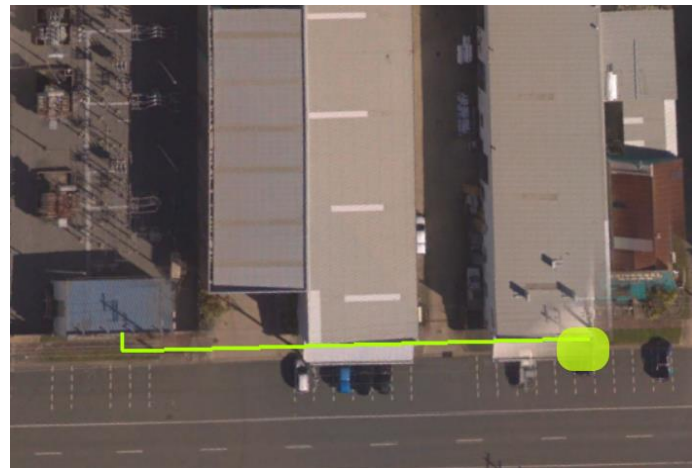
Location of excavation site 2 near Complete Doors on Tennyson Street to provide access to old River Street cable.
